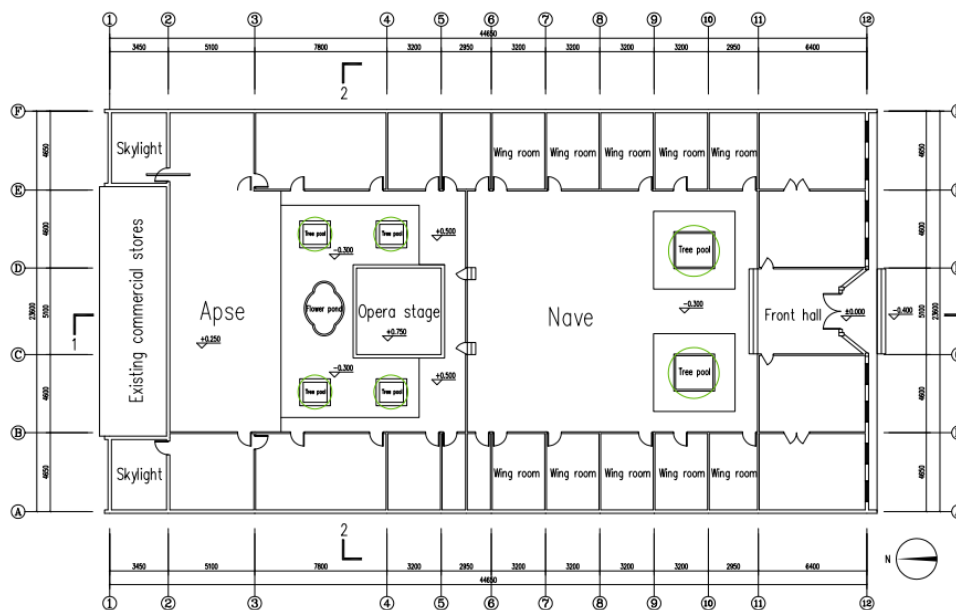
Floor plan of Jiangxi Guild Hall in Luodai Ancient Town 1:100
